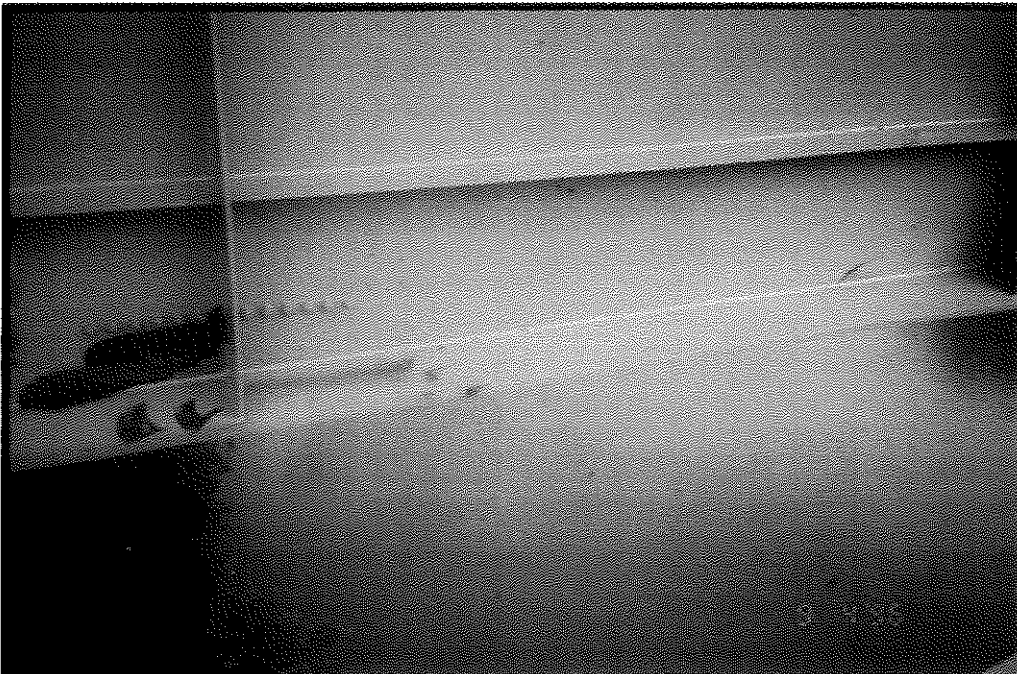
DISBONDING ON THE EXTERIOR FACE OF THE SOUTH MAIN GIRDER OF THE WESTBOUND I-64 BRIDGE OVER THE KENTUCKY RIVER.
